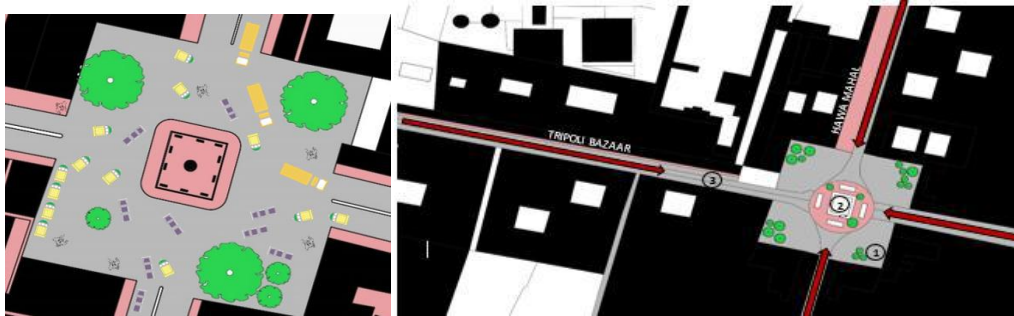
plan of badi chaupar (source: traditional jaipur study, 2014)
